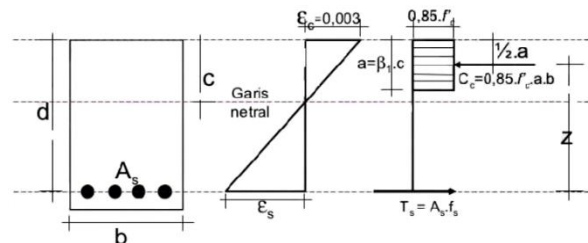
Strain and Stress Distribution in Single Reinforced Beams
